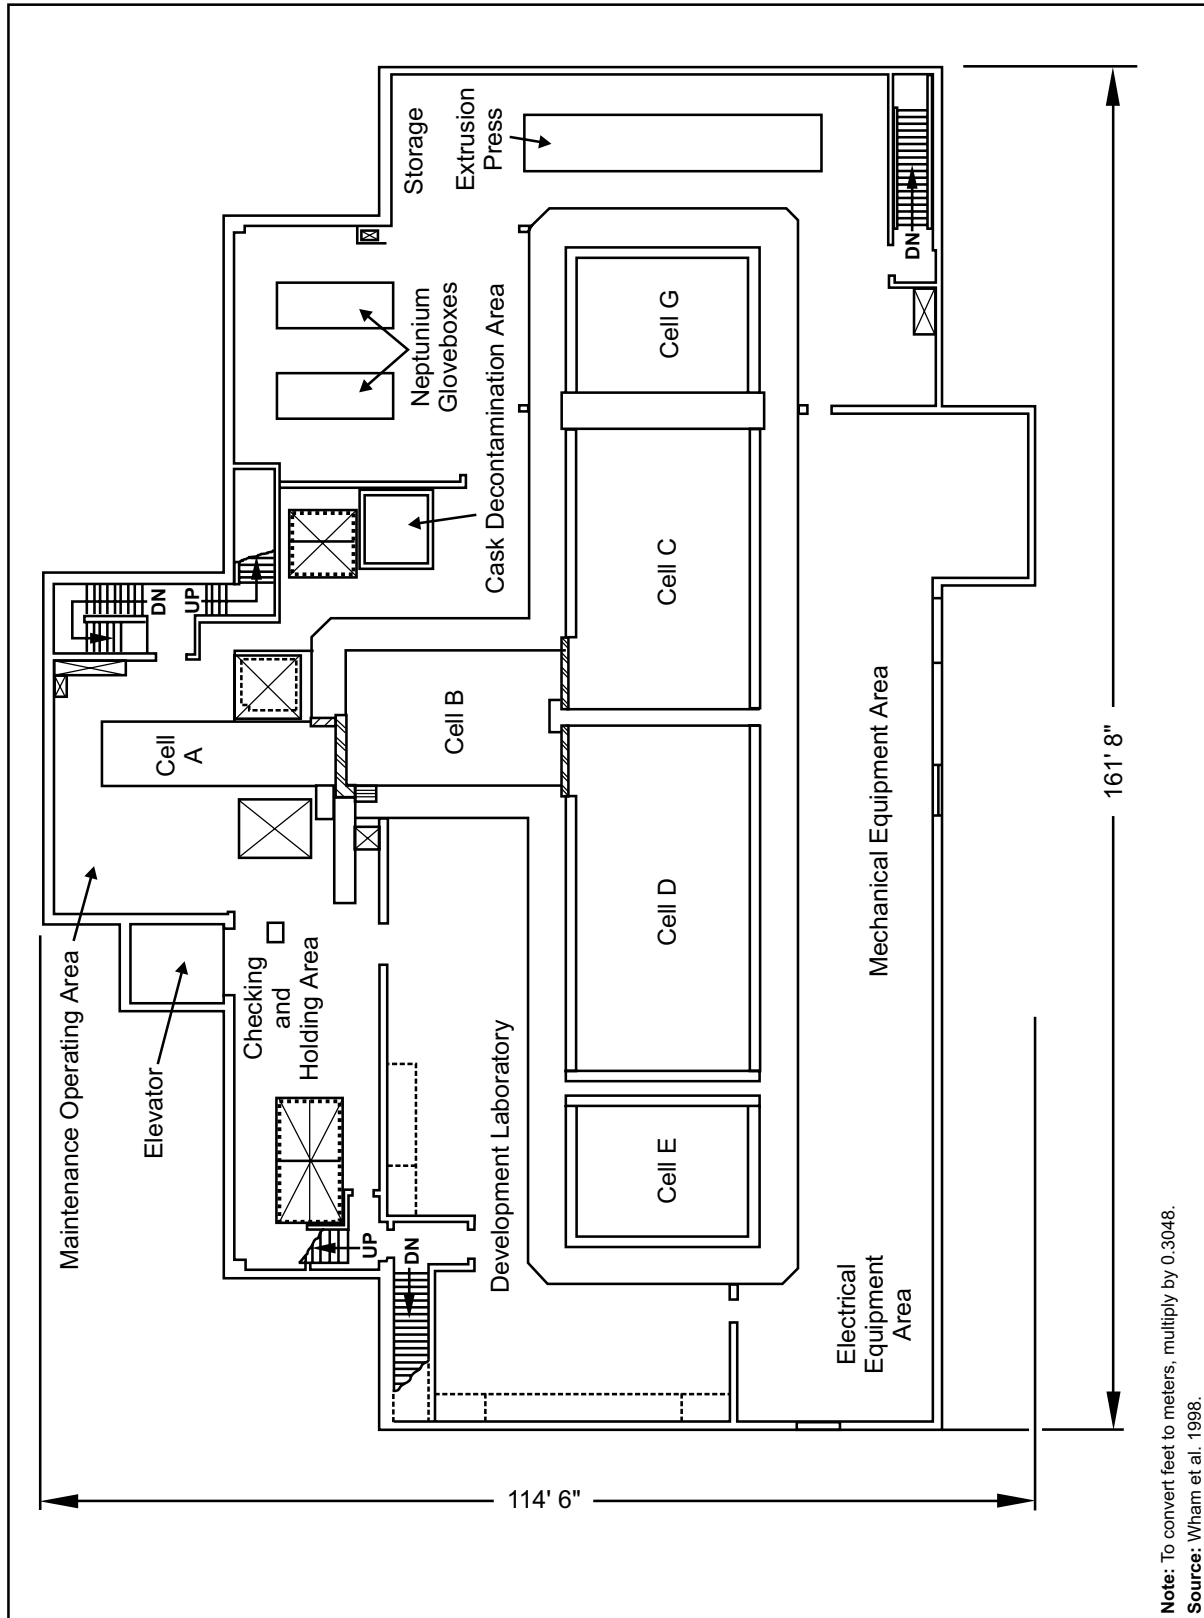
REDC Building 7930 Second Floor Plan View (Cross Section)
